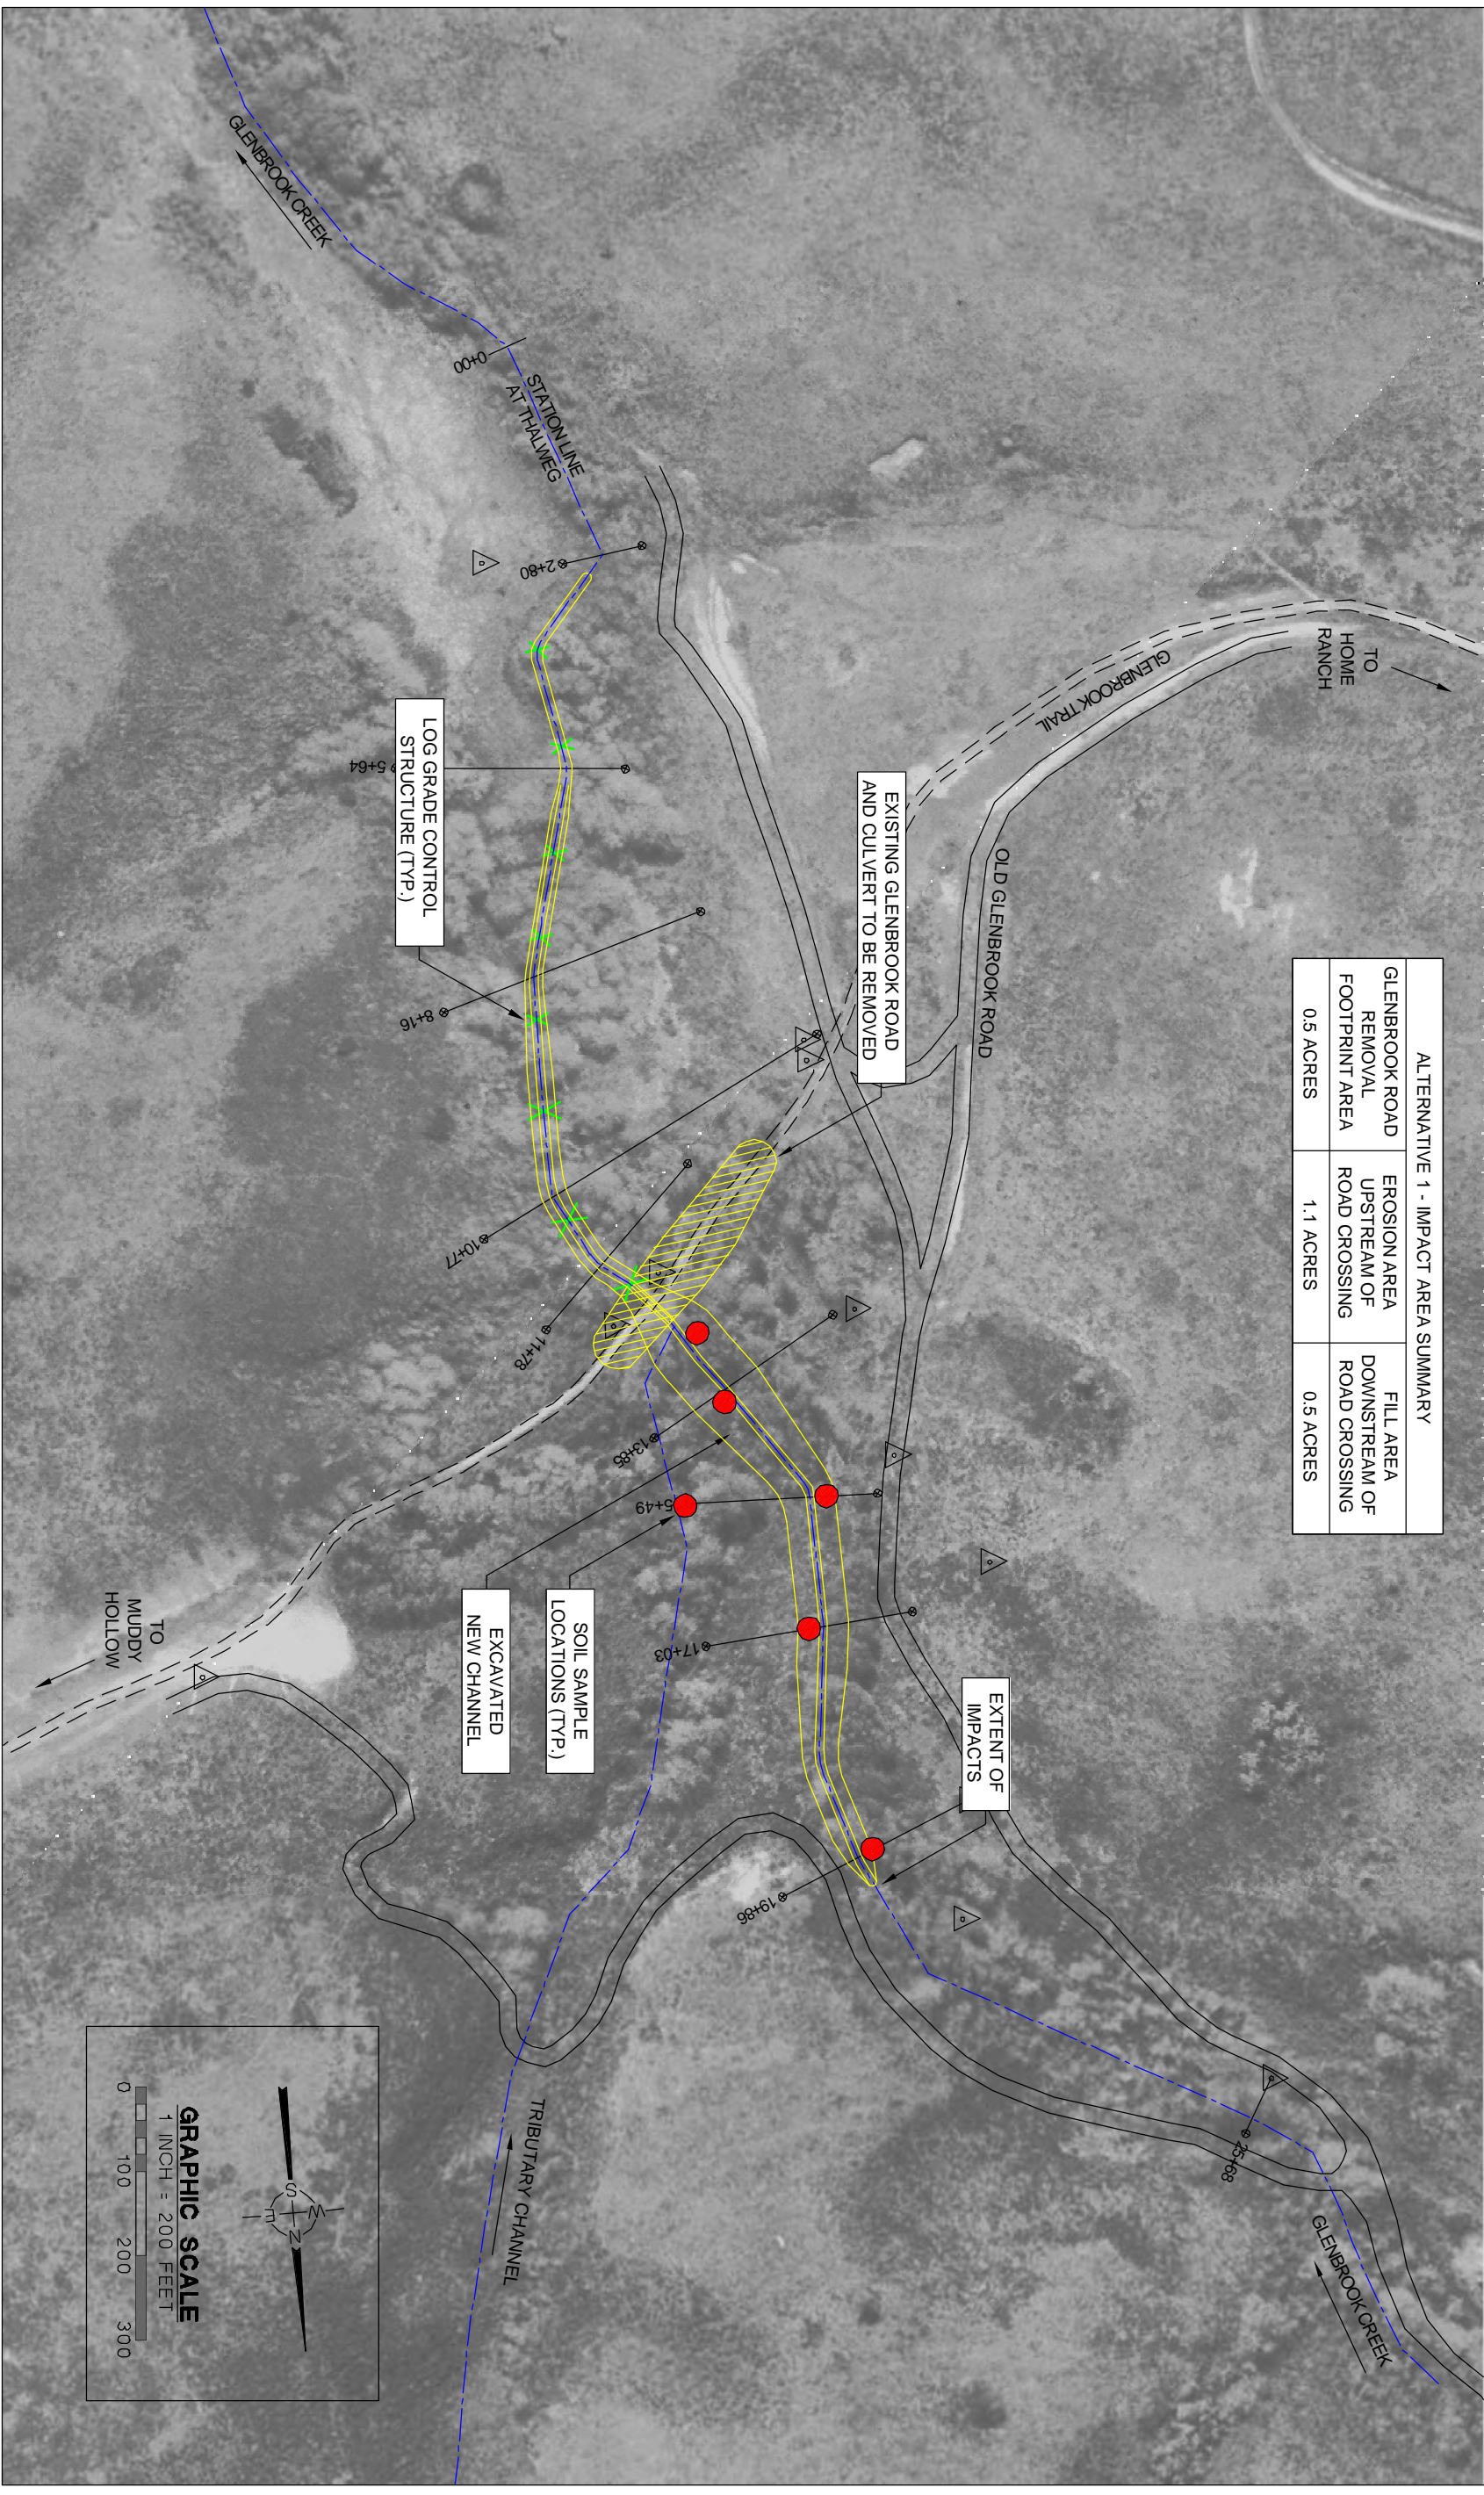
Alternative 1: Glenbrook Crossing Restoration Site Plan - Channel Development
